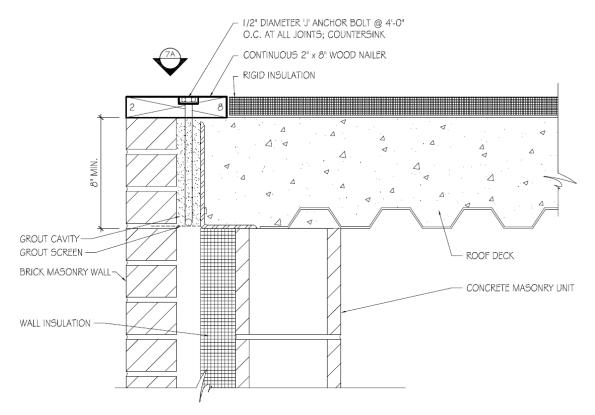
FIGURE I - ROOF EDGE WOOD BLOCKING - ANCHOR BOLT SECUREMENT
